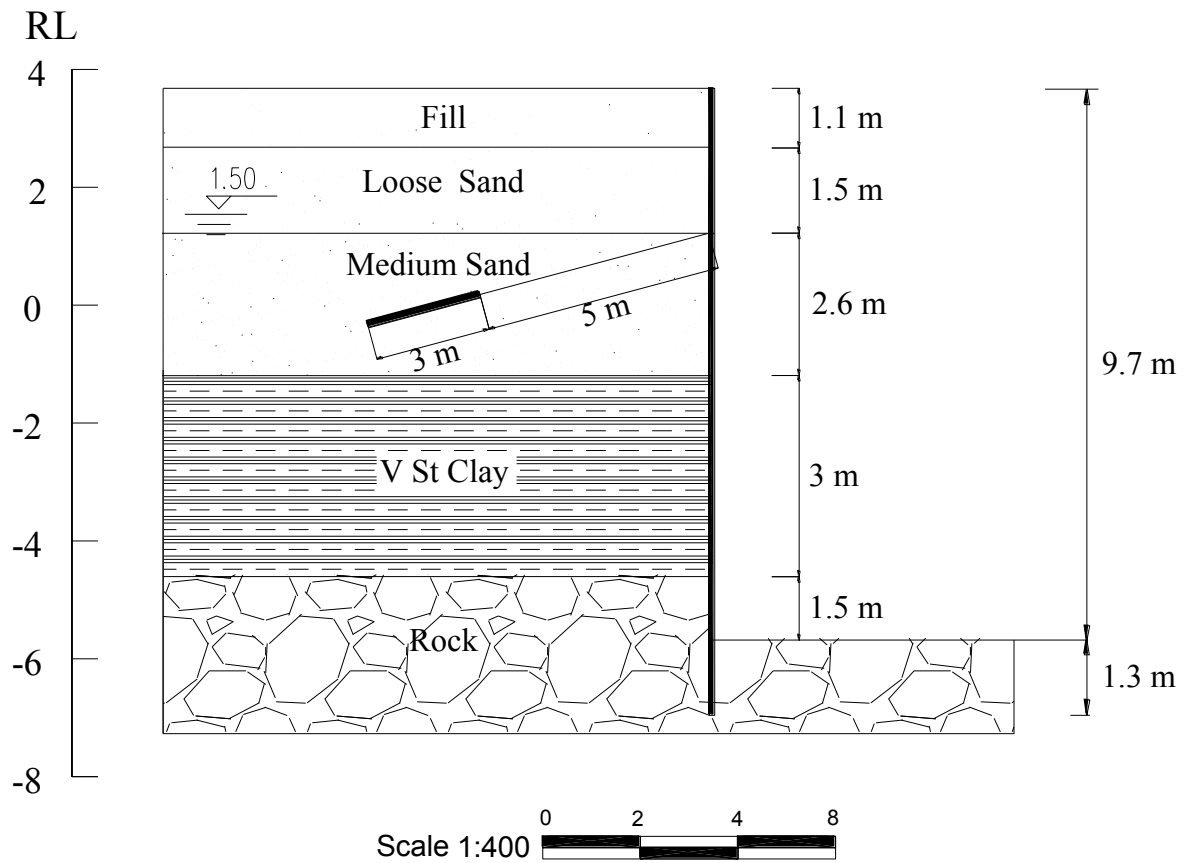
(b). Anchored secant pile wall system of Sundale project
